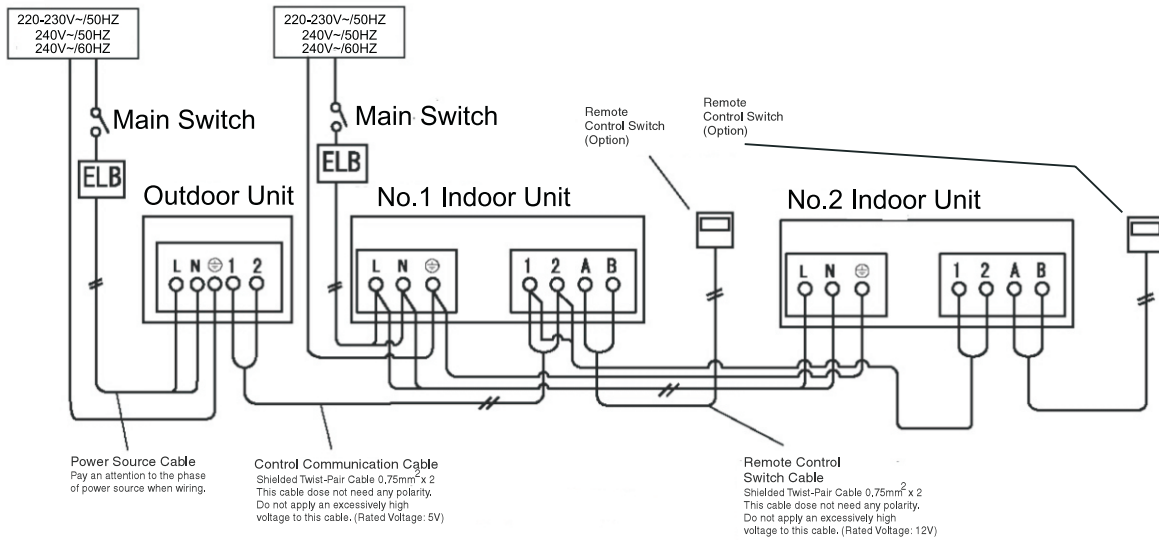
Wiring Connection for Indoor & Outdoor (1 PHASE)
